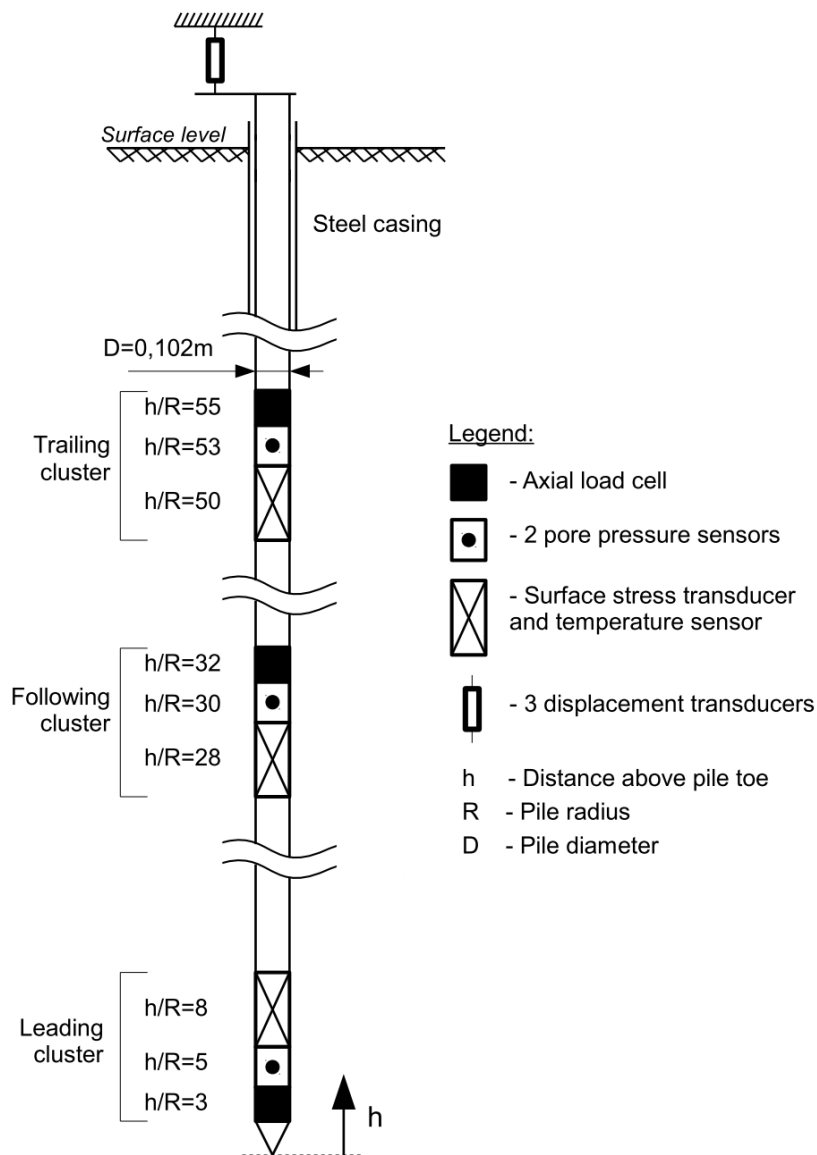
Imperial College Instrumented Pile used in Canons Park (after Bond and Jardine (1991))
